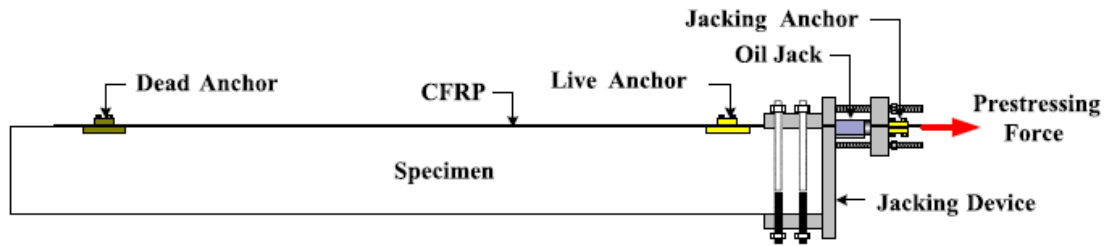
Anchorage and Prestressing system. Yang et al 2009
